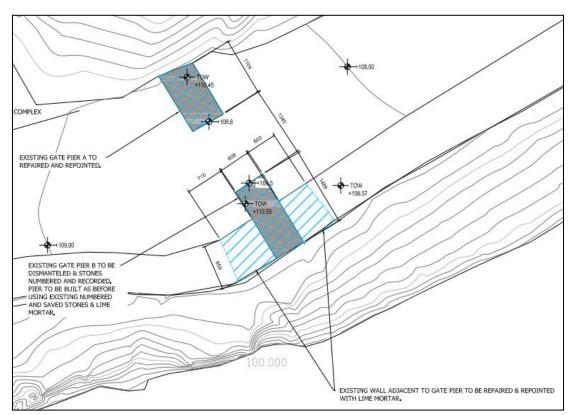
Proposed repair works to gate piers at Upper Lighthouse (Adapted from OPW Consent application documents)
